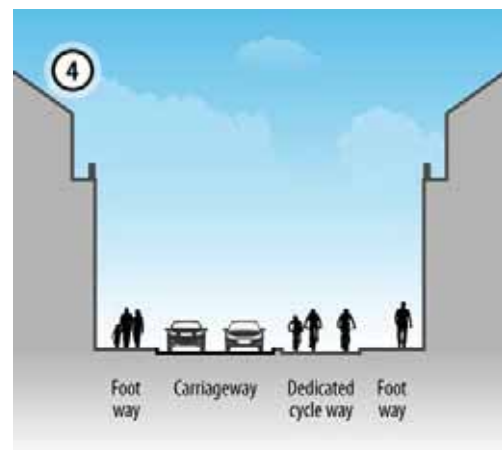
Indicative Street Section 4: Primary Street, Ashton Centre.
